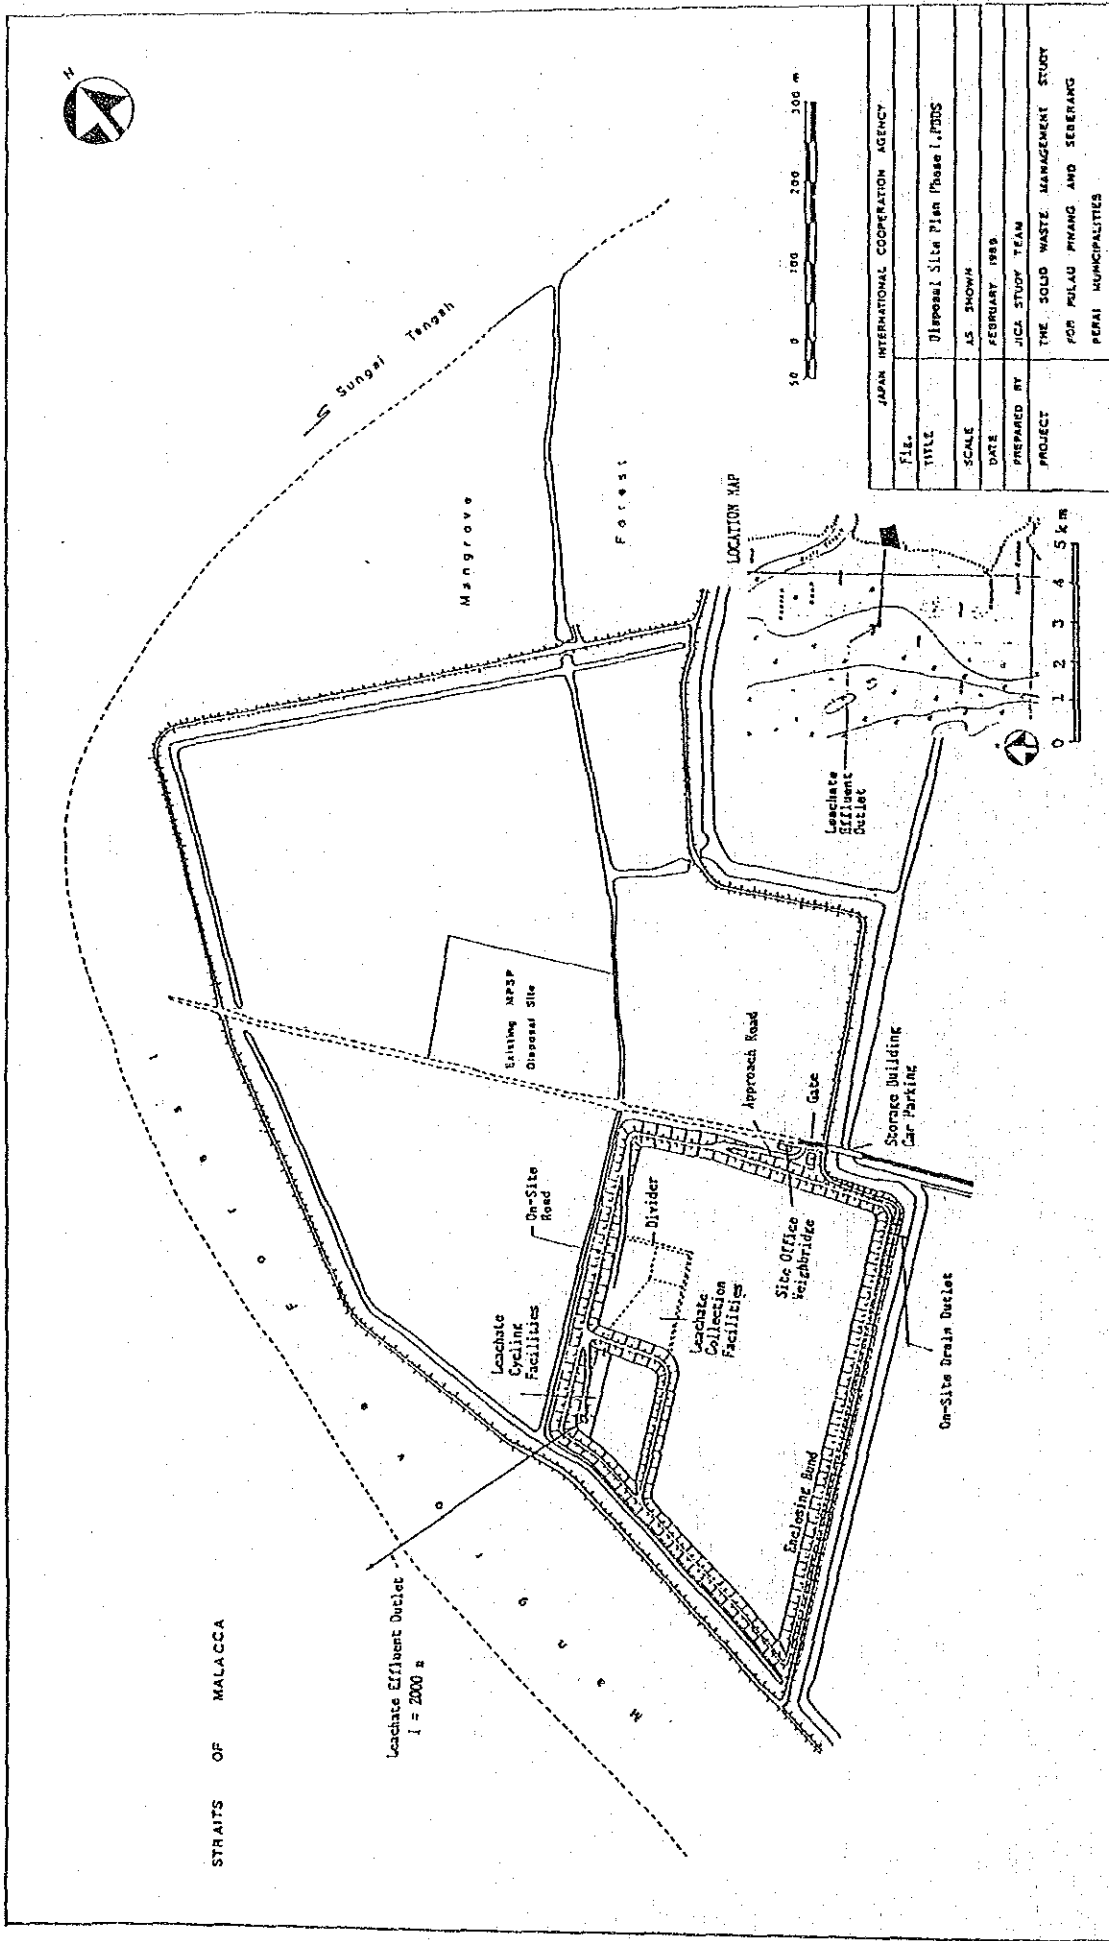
Disposal Site Plan Phase I, PBDS
